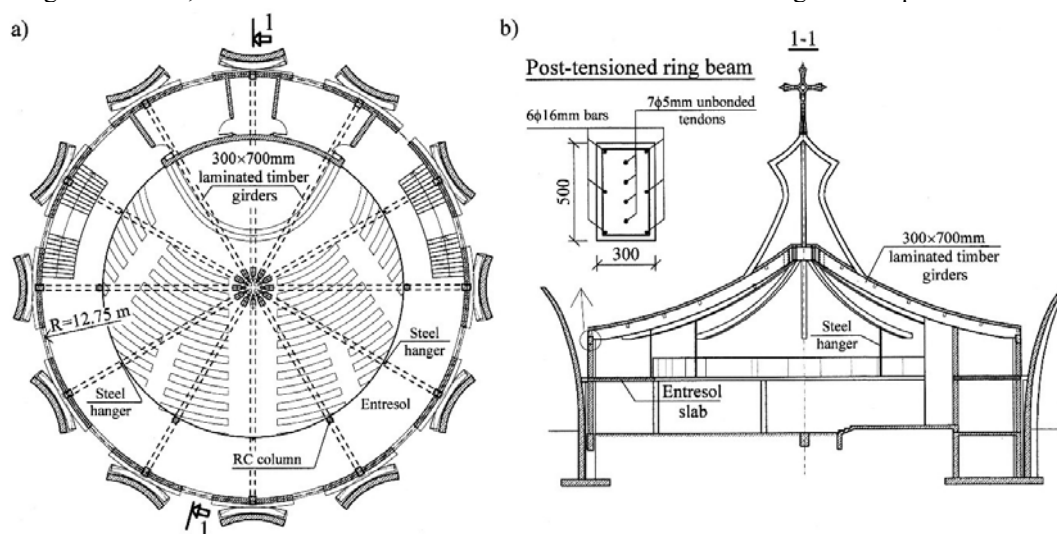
The church plan (a), vertical cross-section and post-tensioned ring beam (b).
